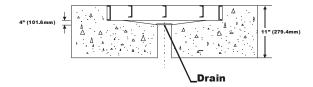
DRAIN INSTALLATION DIMENSIONS
